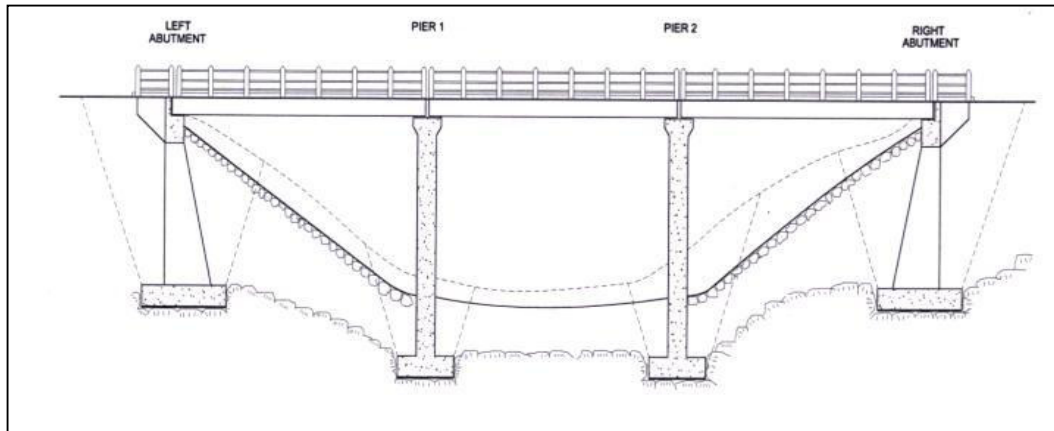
Diyameegolla Kandura Bridge - Longitudinal section on Bridge
